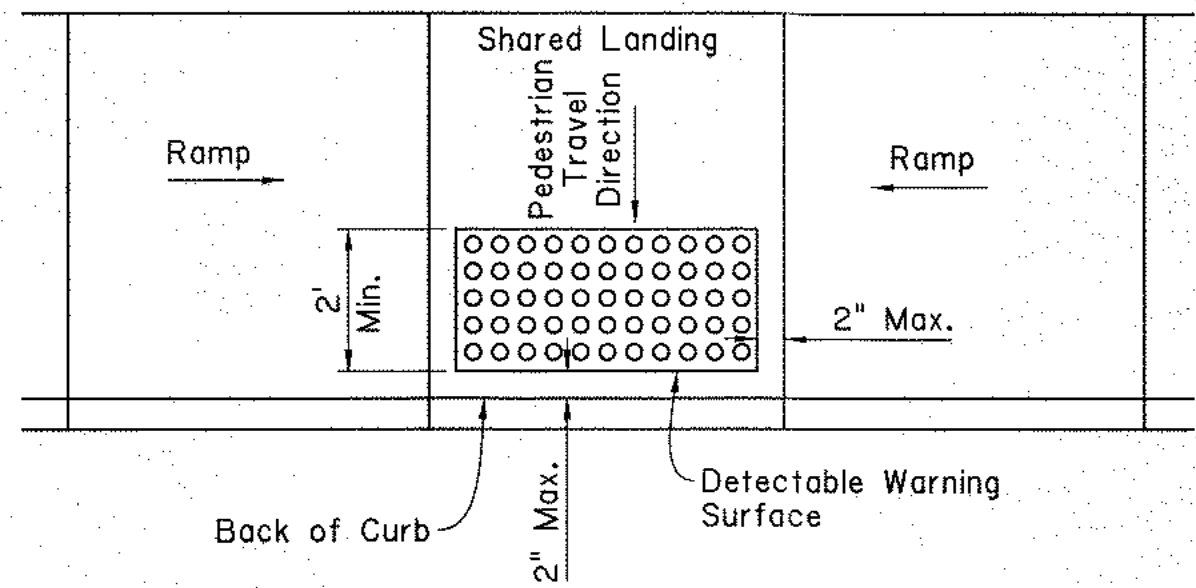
DETAIL G: SIDEWALKS AND CURB RAMPS AT MEDIANS
